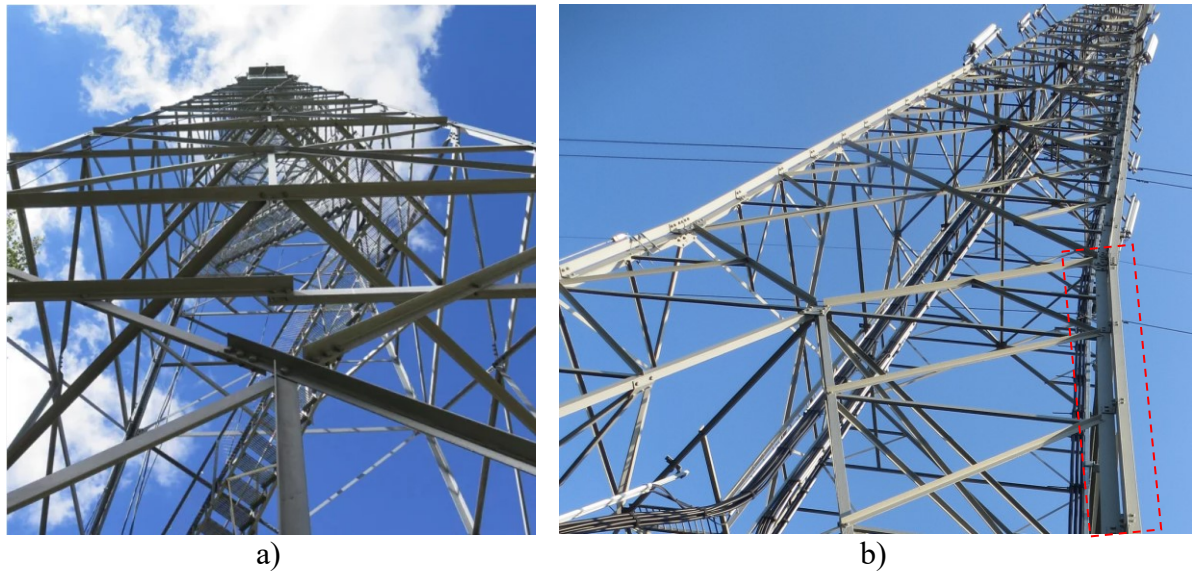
a) Telecommunication angle steel tower [6] and b) structural reinforcement high-voltage tower [7].
